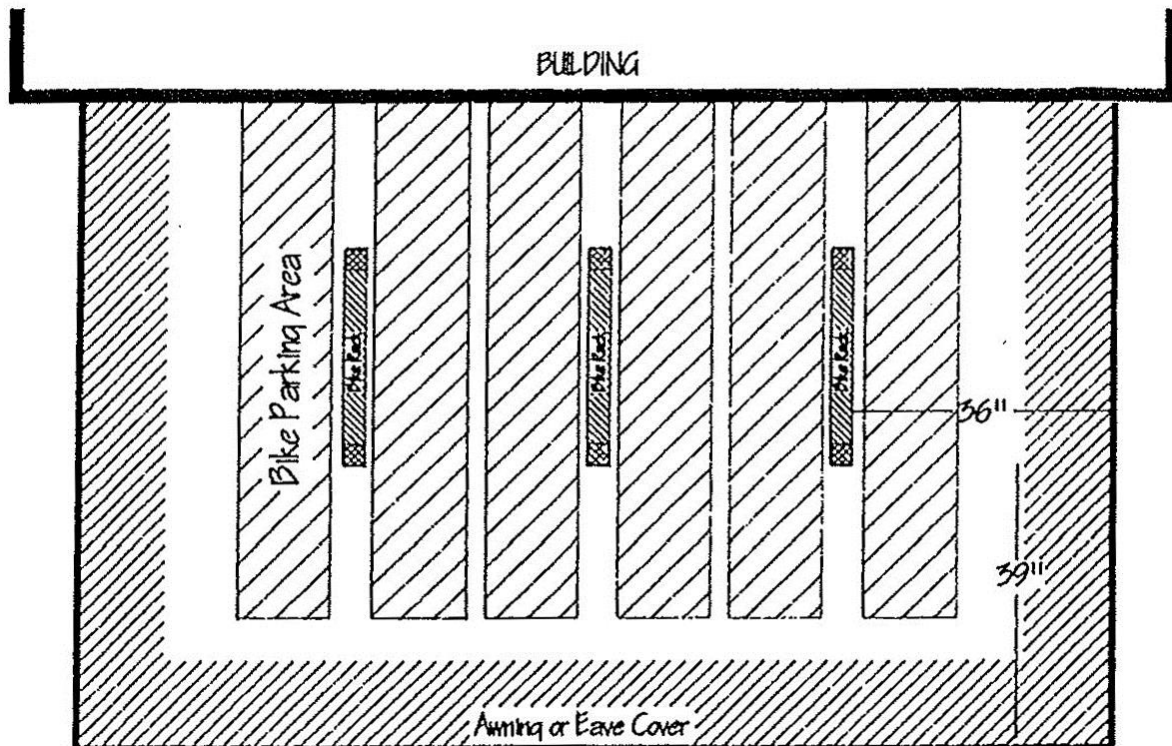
I.6- 18.4.3.070.C.6 Bike Parking Layout
